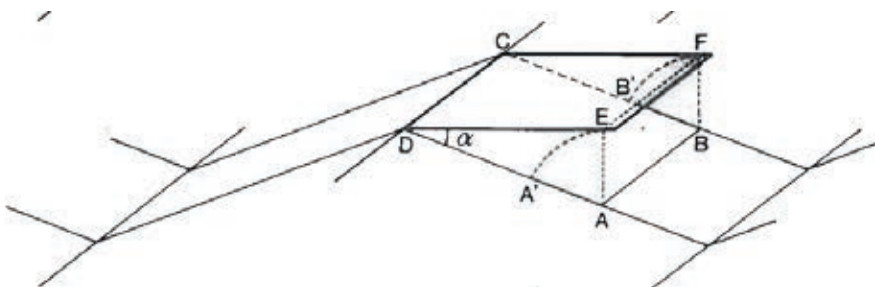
Sketch of the opening of a roof vent in a standard Venlo greenhouse.
